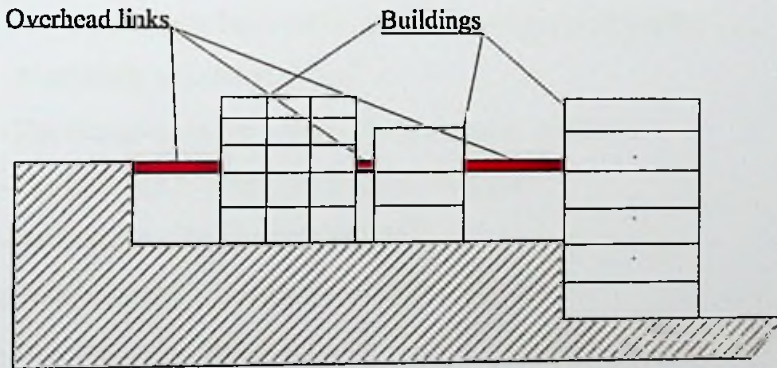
Overhead connections using natural level drops for accessibility improvement
